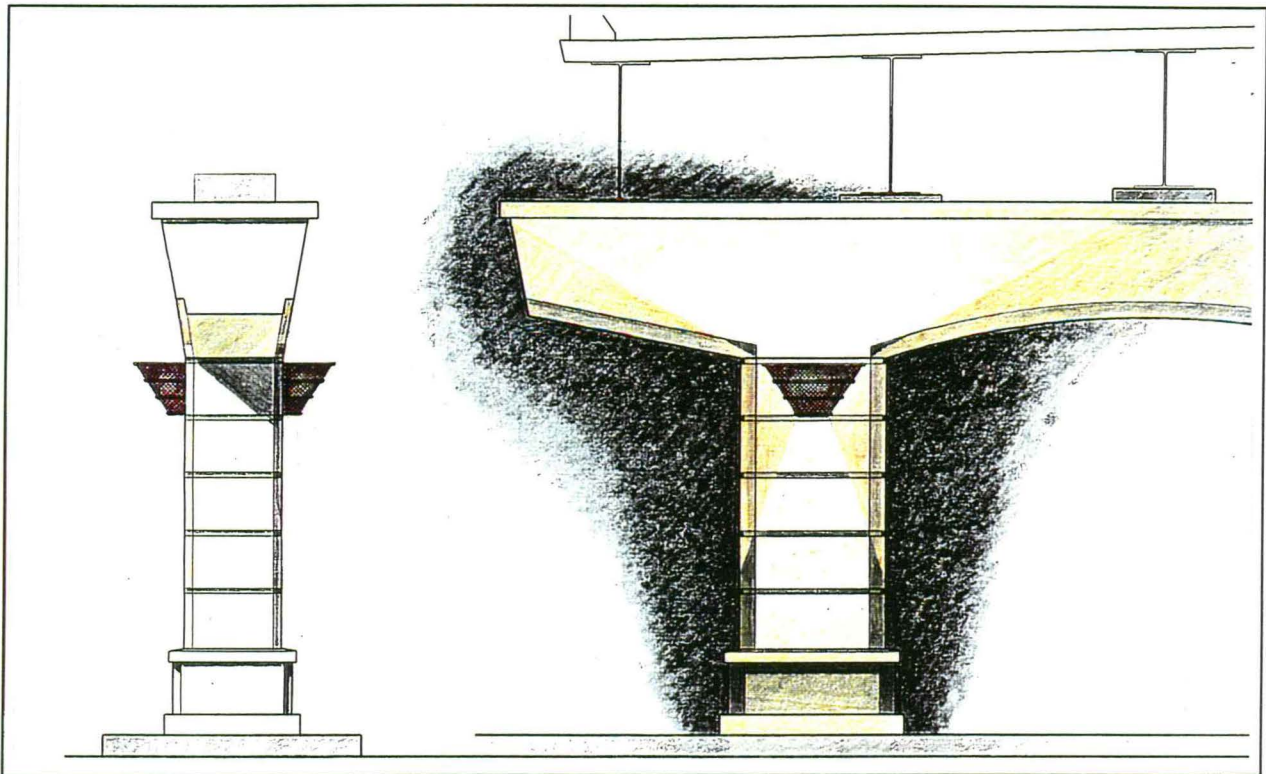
I-80 over Merle Hay Road - Proposed Structure
